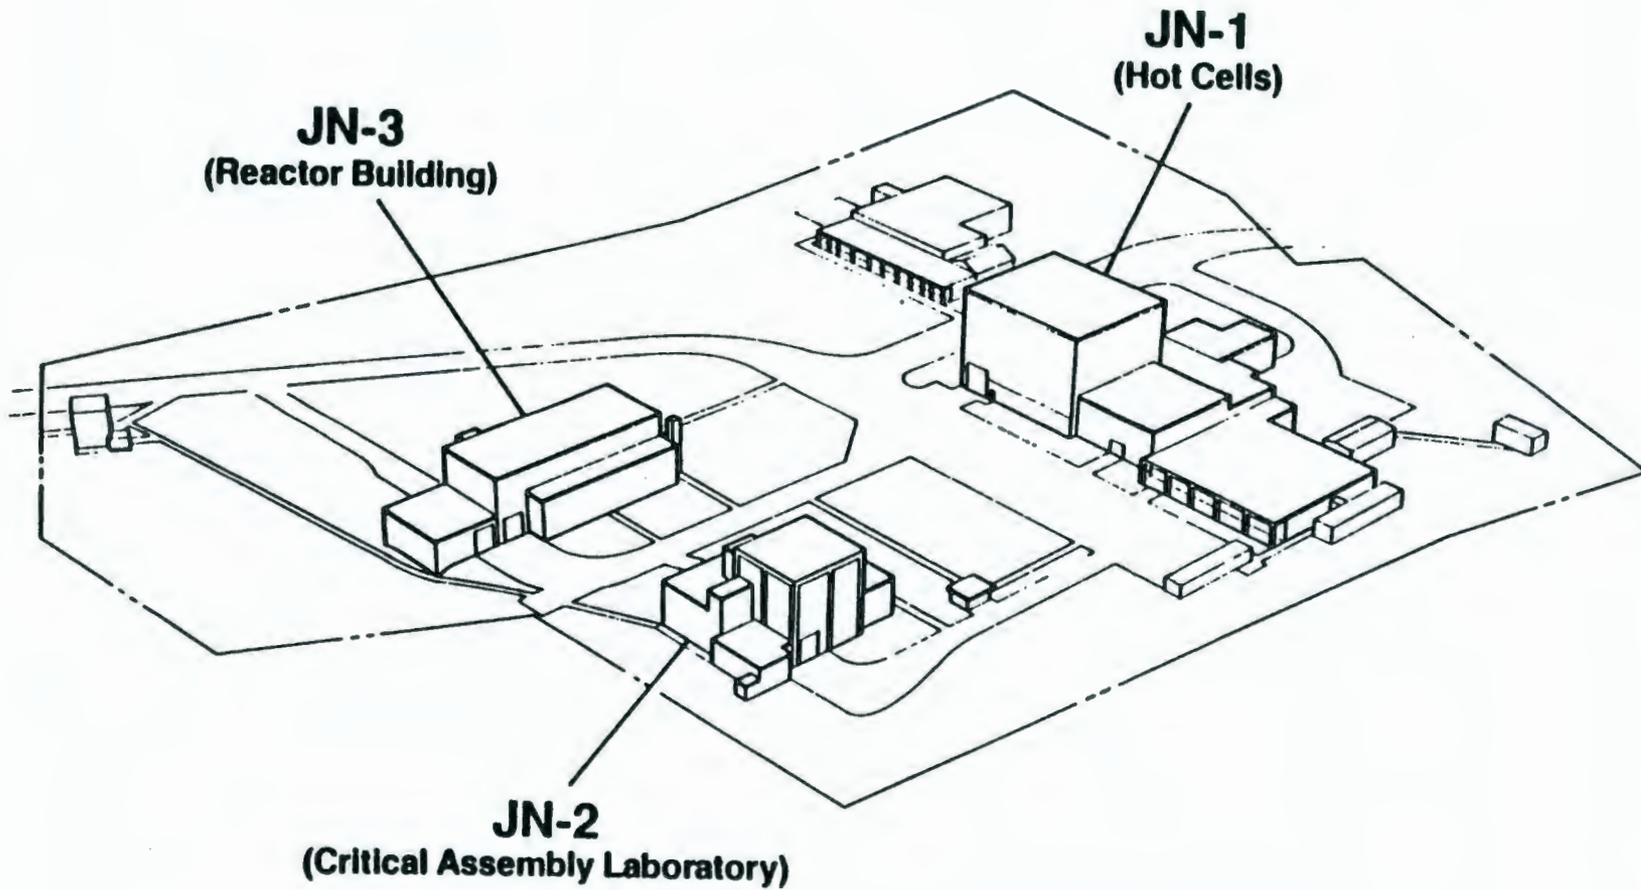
Building Numbers and Locations at the West Jefferson Site
